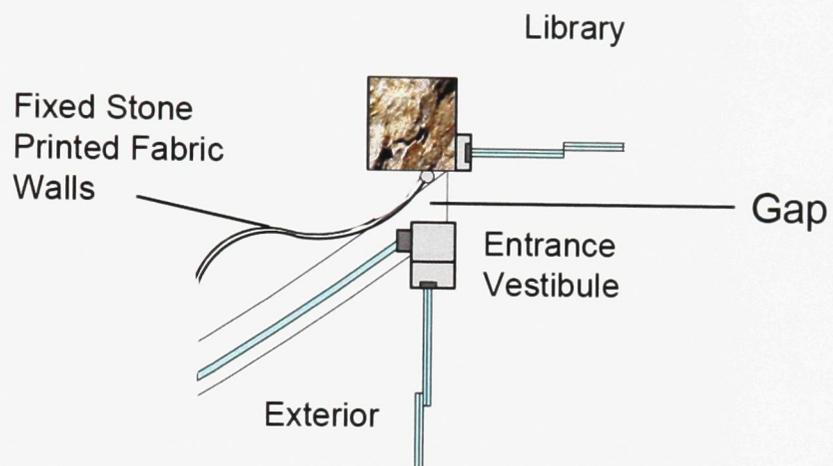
Detail of fixed stone printed fabric wall and gap at the main entrance. Rebecca Han, 2011
